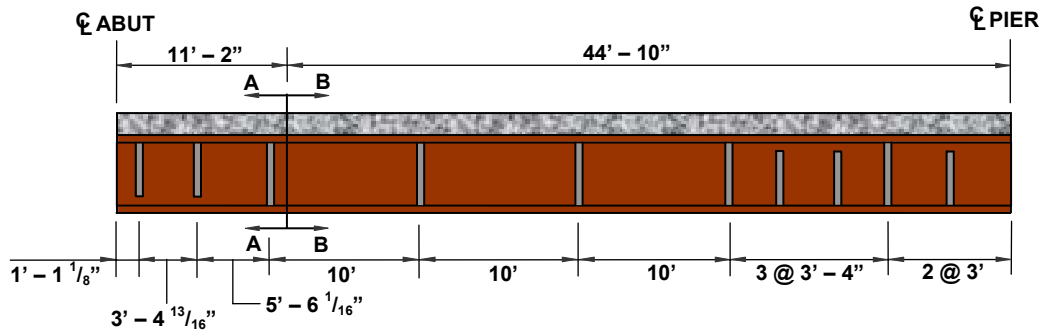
AISI-FHWA bridge plan view showing the location of flange transitions
